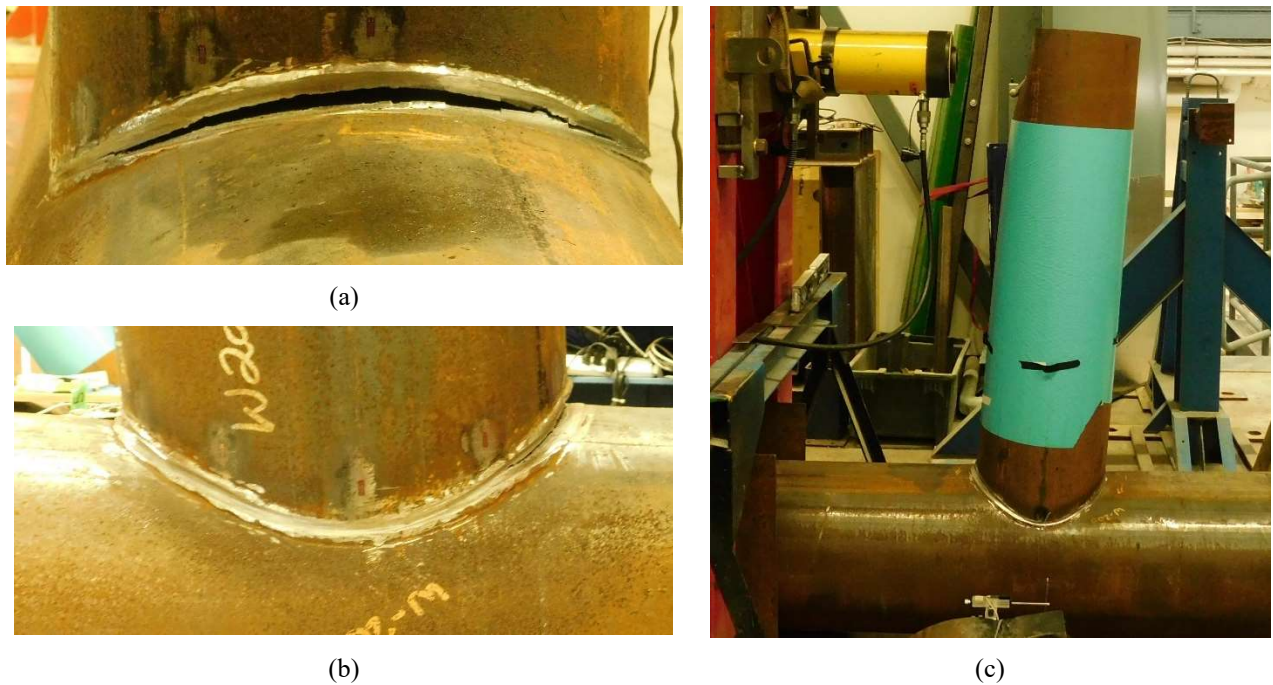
Failure of T406-324-0.7P (a) weld fracture, (b) chord deformation and (c) branch deformation
